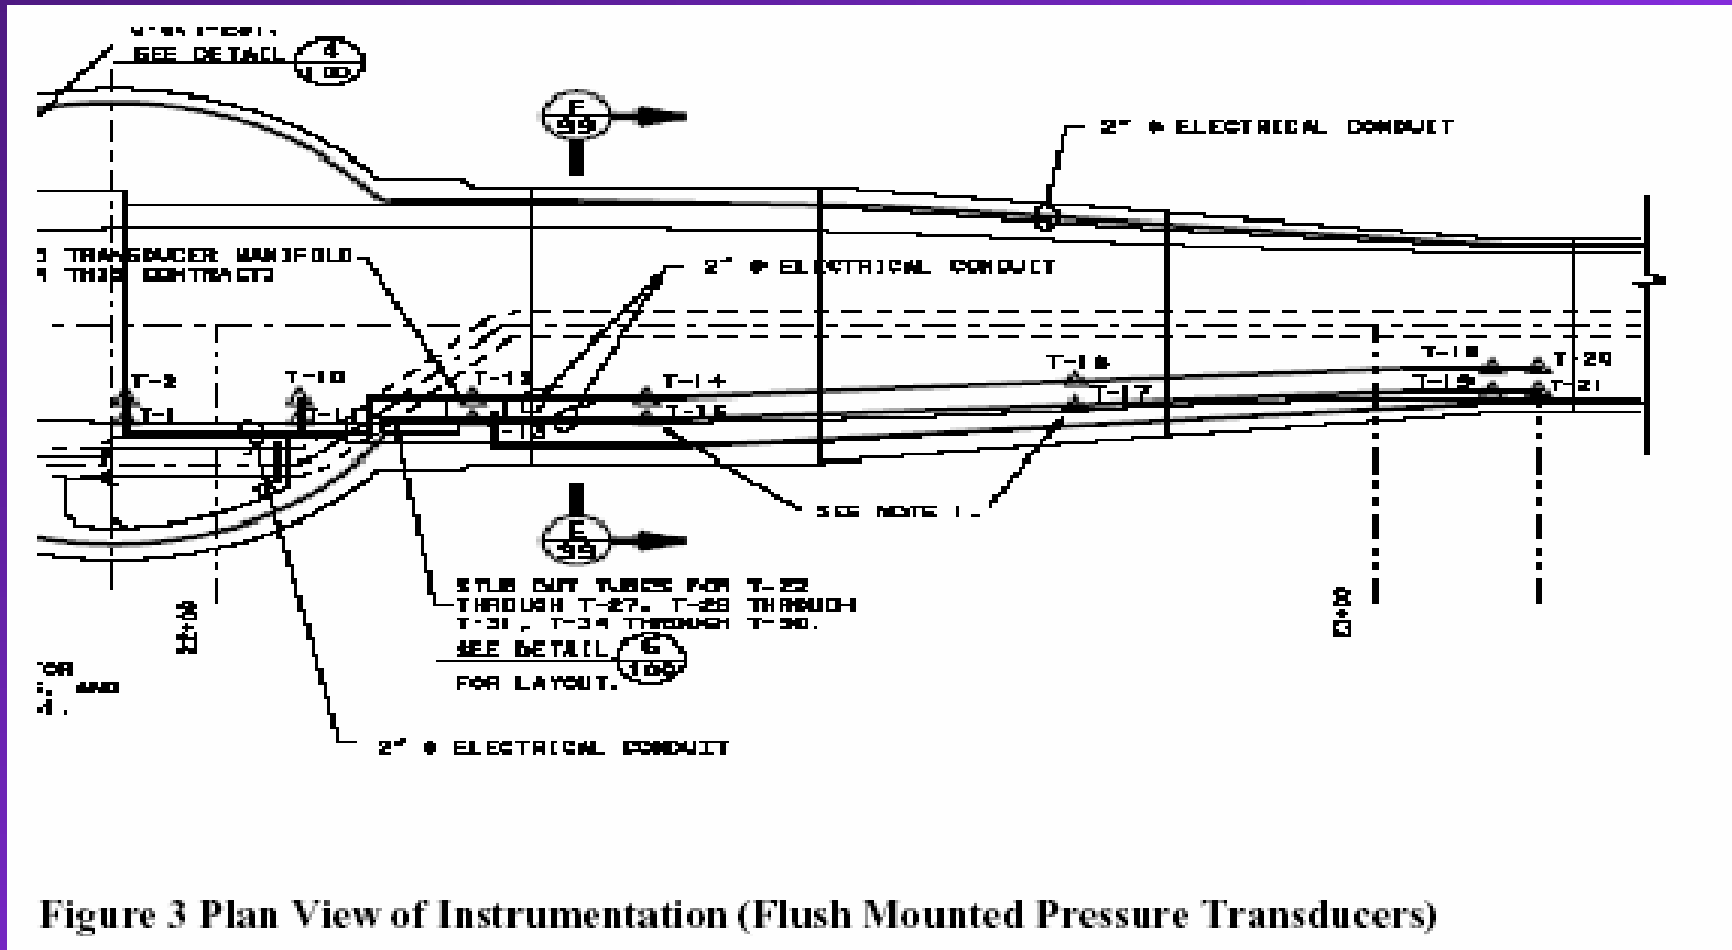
Plan View of Instrumentation (Flush Mounted Pressure Transducers)
